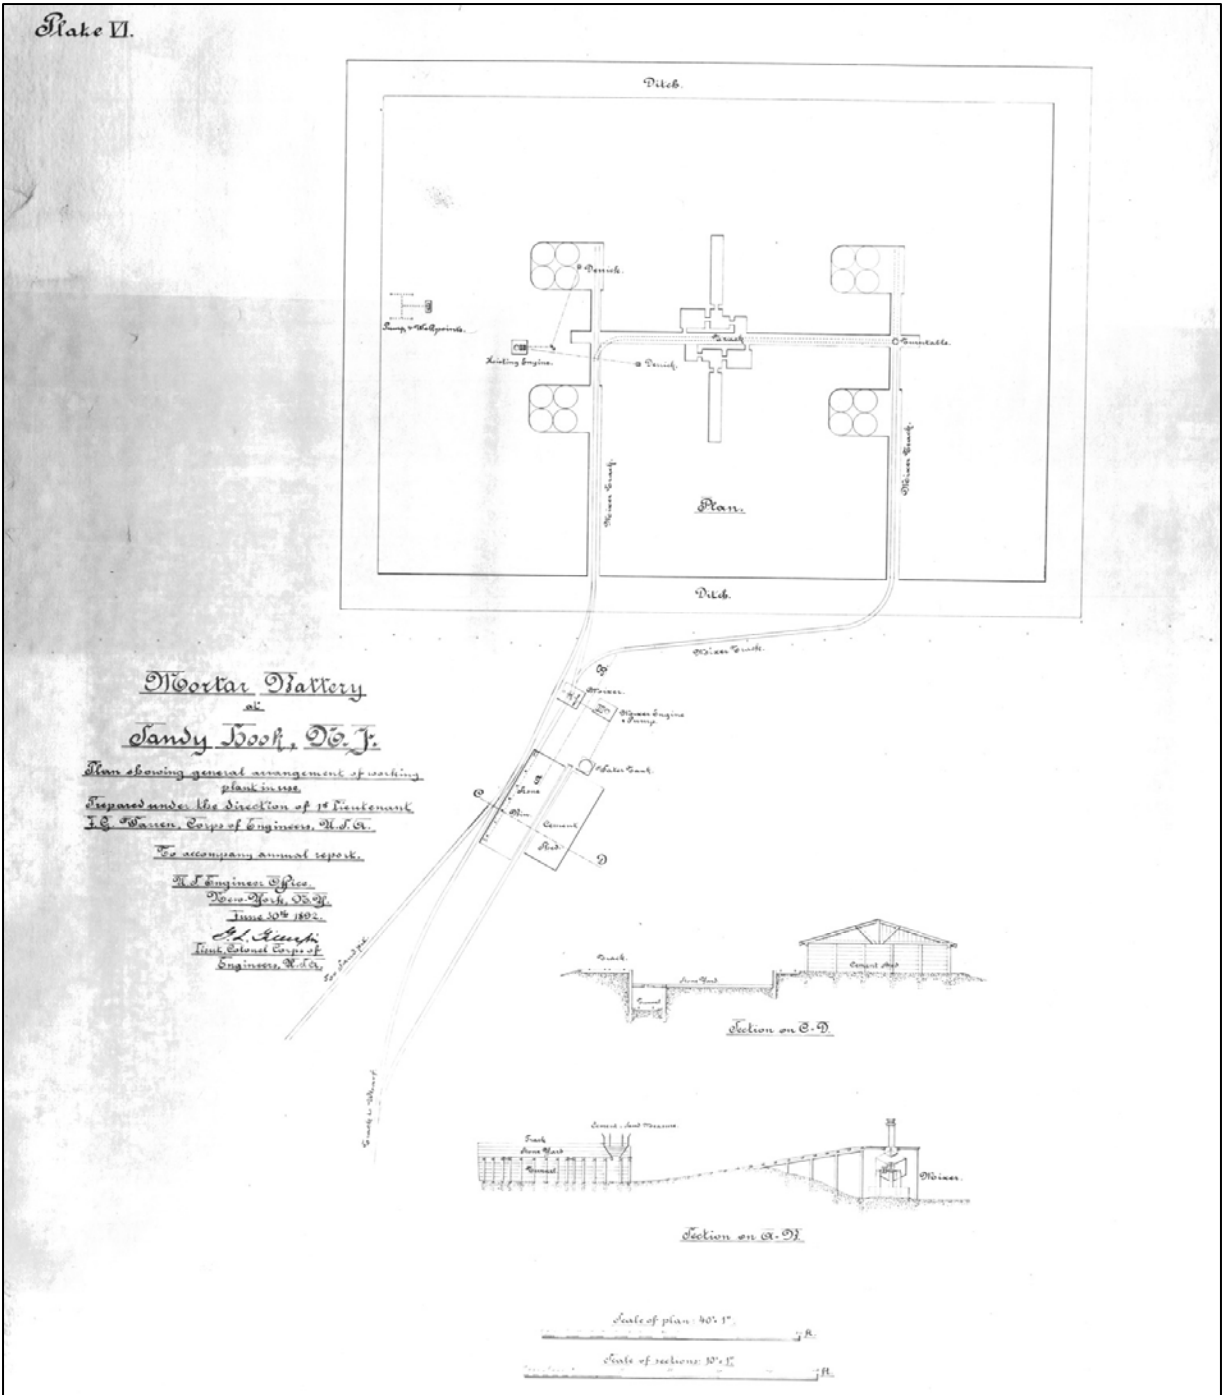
"Mortar Battery at Sandy Hook, N.J. Plan showing general arrangement of working plant in use, June 30, 1892."
